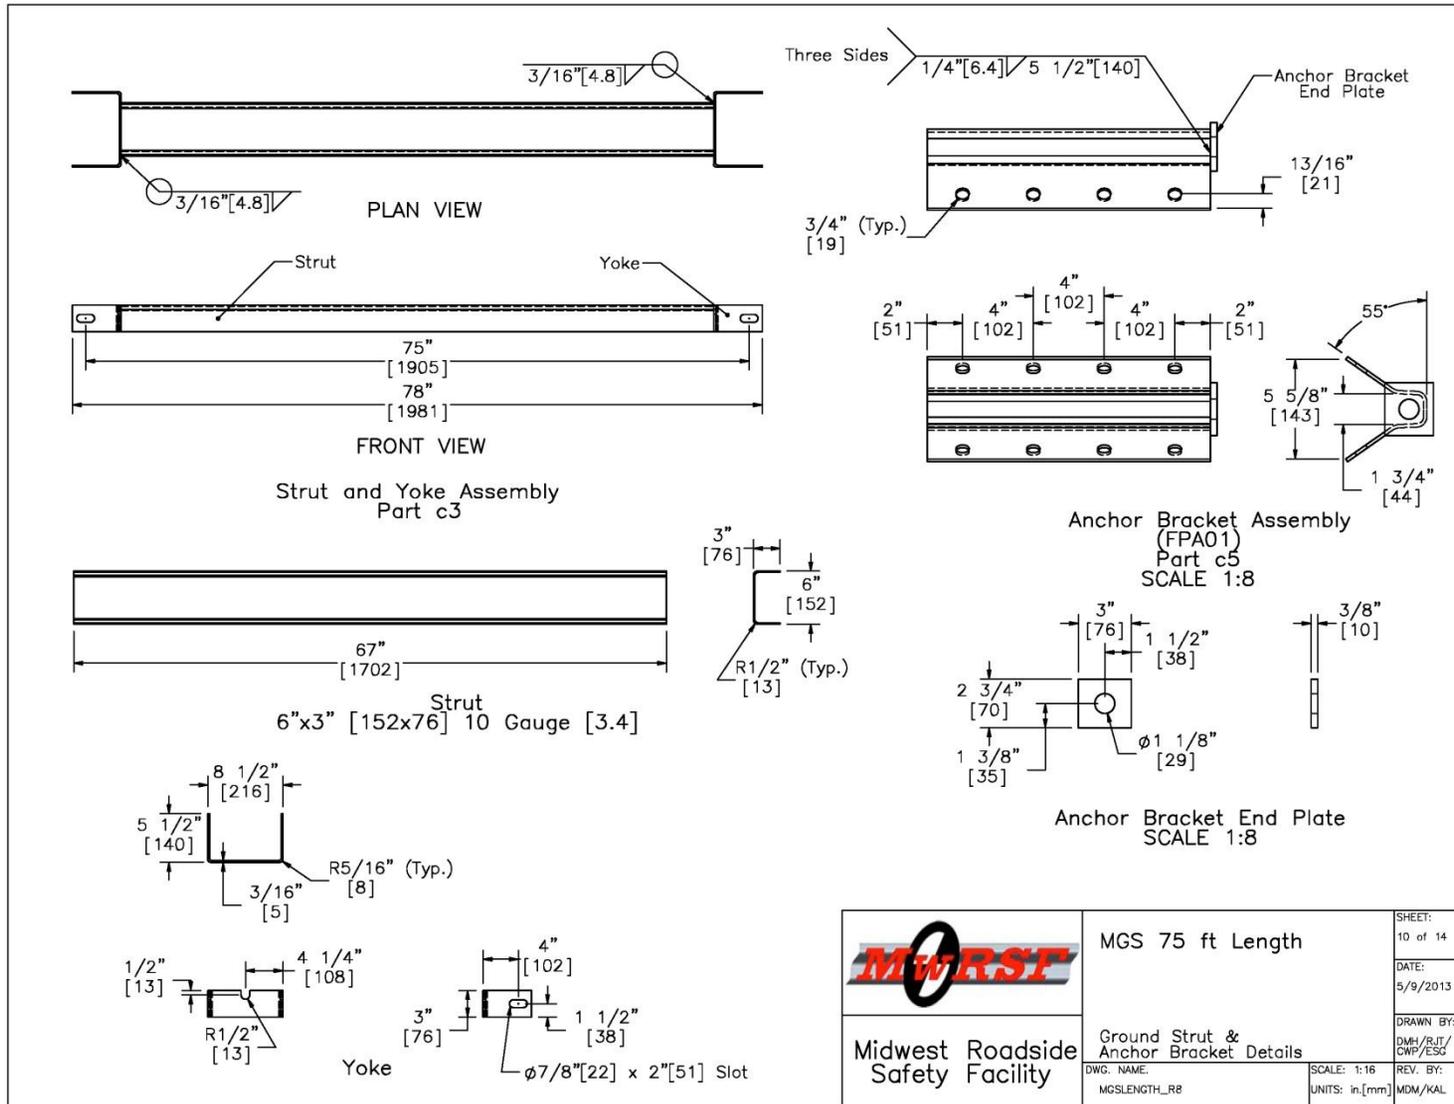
Ground Strut and Anchor Bracket Details, Test No. MGSMIN-1
